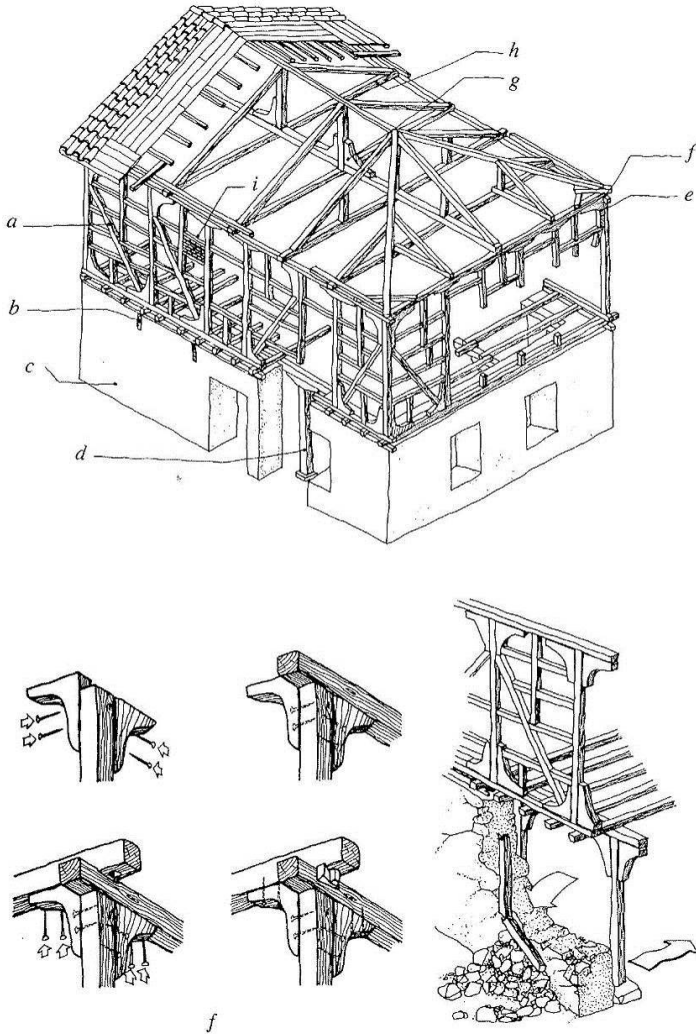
Example of a mixed masonry-timber building (Greek islands, 1800 A. D.). *a* timber diagonal, causing compression perpendicular to the grain in the lower corner, *b* anchoring of the timber construction in the masonry, *c* masonry as support for the upper timber construction, *d* timber columns to accommodate vertical loads after the masonry fails (see detail lower right), *e* bent timber corner piece to reinforce the timber frame wall, *f* joint that is simply to replace after damage (see detail lower left), *g* corner piece made of wood to reinforce the roof construction, *h* tie beam to prevent horizontal forces on walls, *i* brick infill. The floors cannot act as diaphragms, due to their workmanship. (according to Touliatos, 1993, STEP 1995 Article D10)
